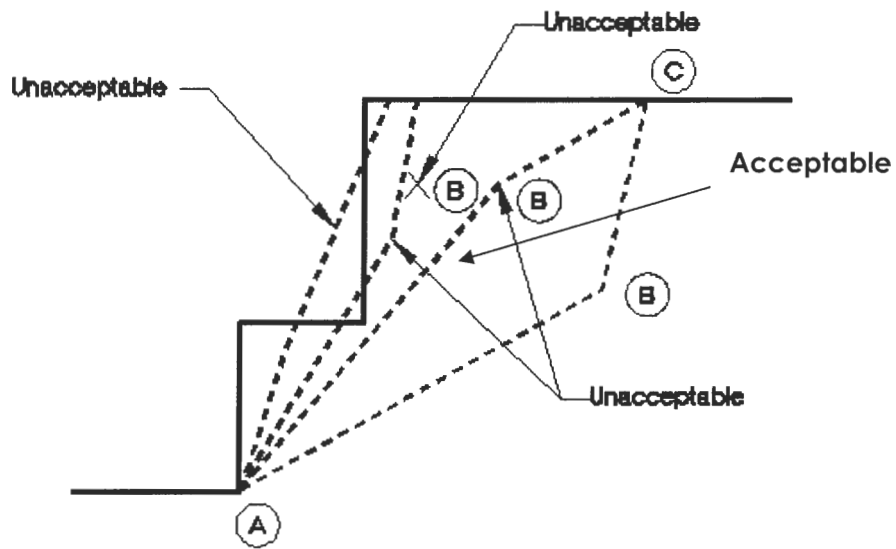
Example of acceptable and unacceptable intersection (B) Points
